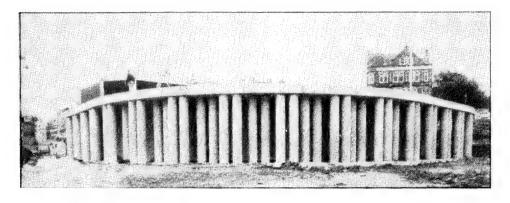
Erected units with lower joints grouted and temporary rock anchors installed, Wallasey Cofferdam (from Barfoot 1987)
